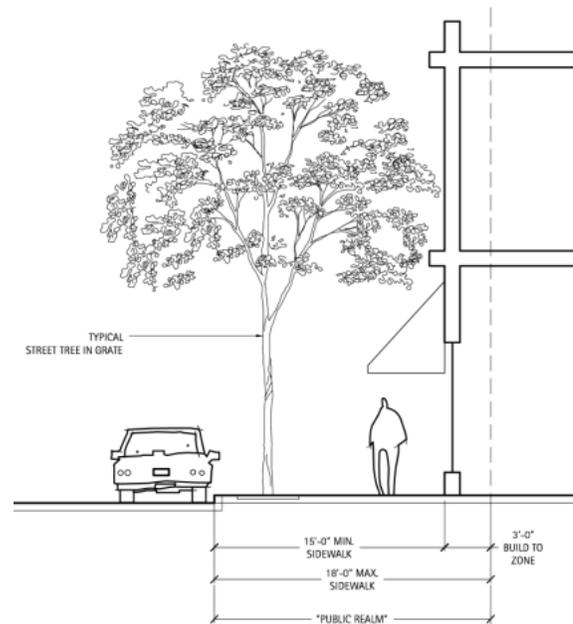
Section of Typical Downtown Streetscape Frontage
